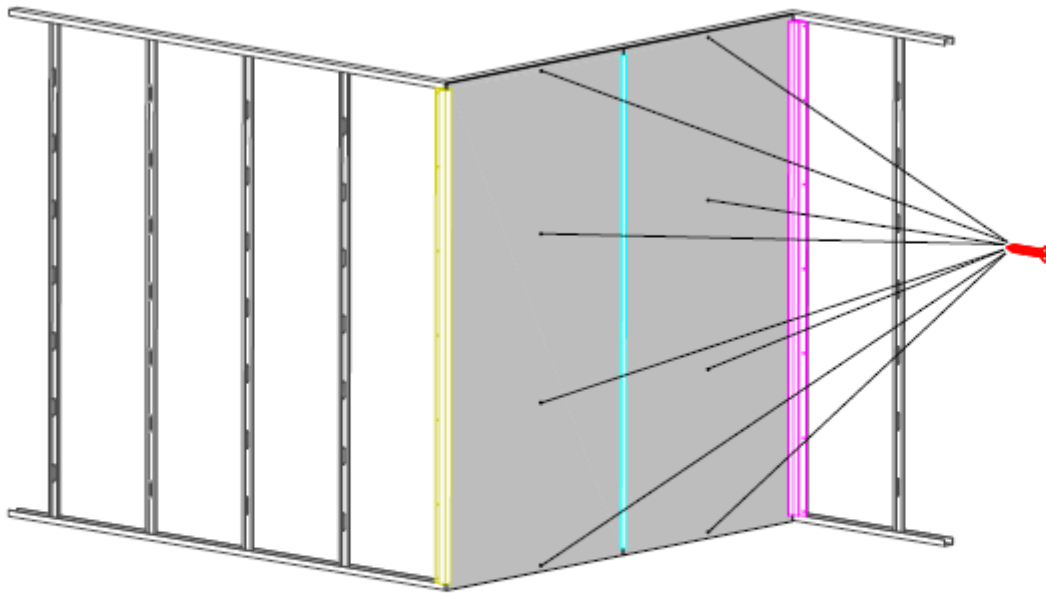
SUREWALLS DRYWALL SYSTEM—PROFILE INSTALLATION
